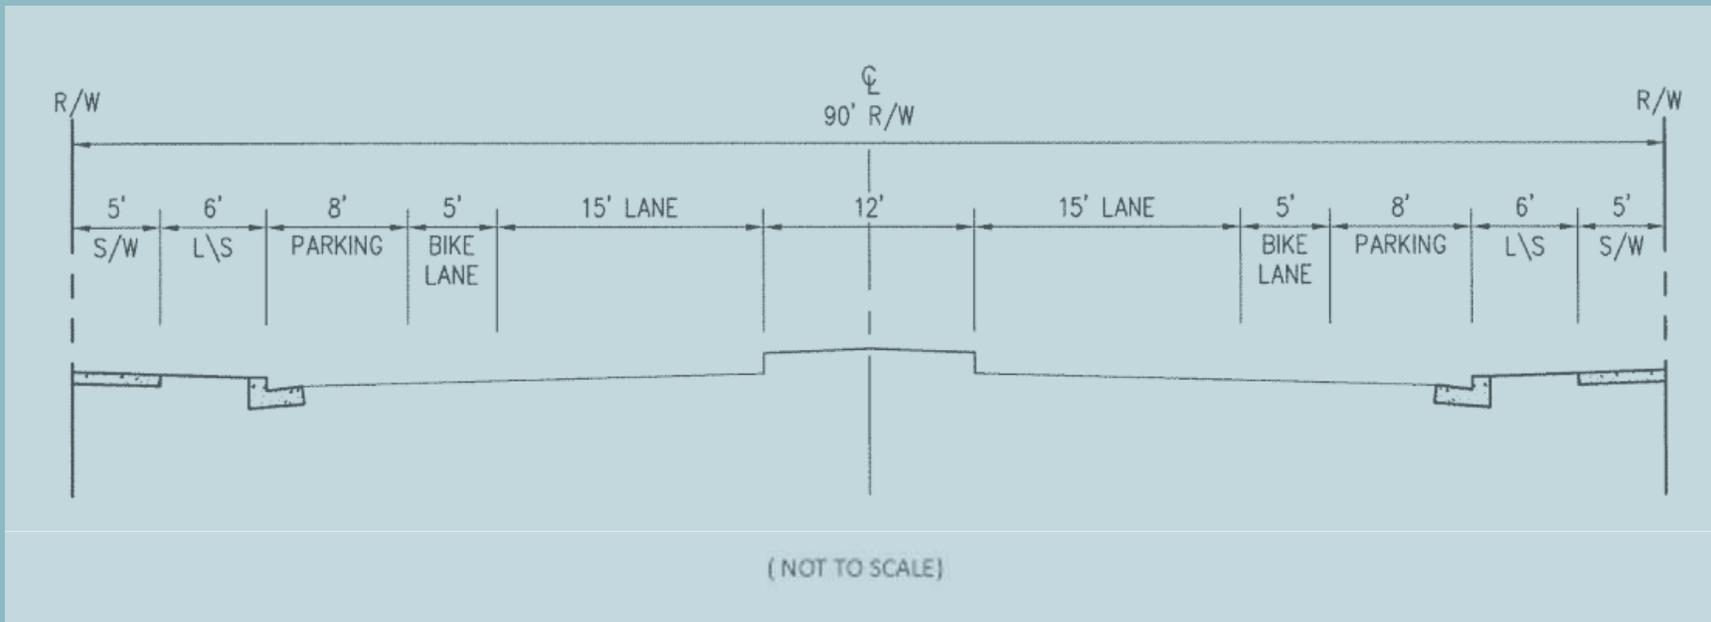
(a) - Enterprise Drive West (West of Transit Station Entrance)
